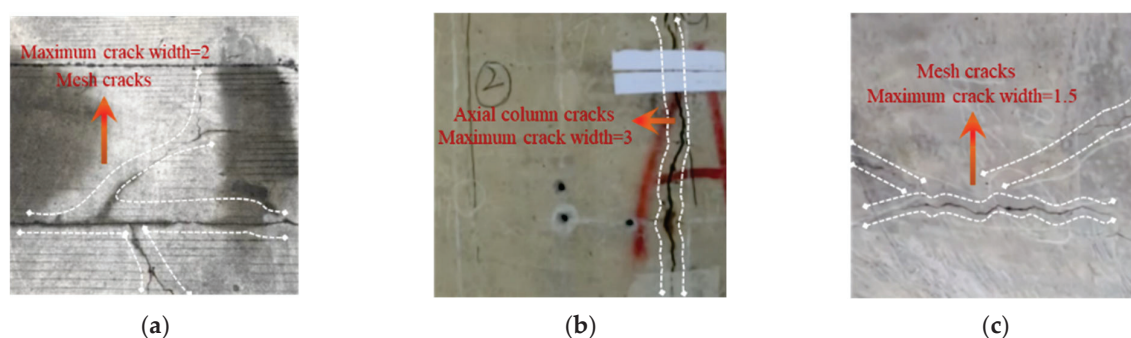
On-site cracks (unit: mm): (a) surface cracks; (b) column crack; (c) beam crack.
